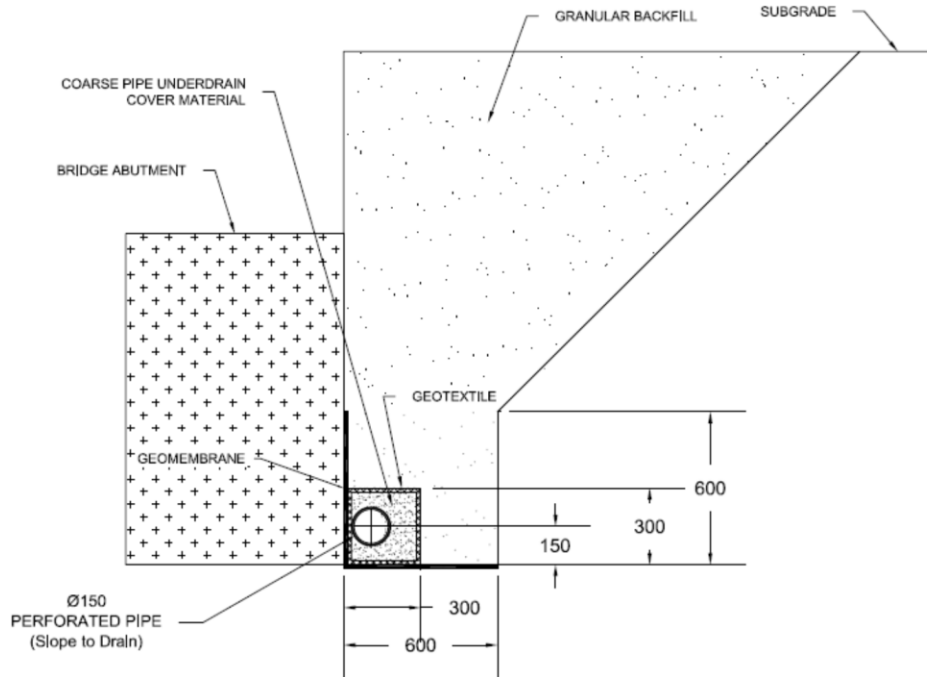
Proposed Abutment Backfill Drainage System with Geomembrane and Geotextile Filter (units in mm: 300 mm≈12 inches) (from Miller et al. 2013)
